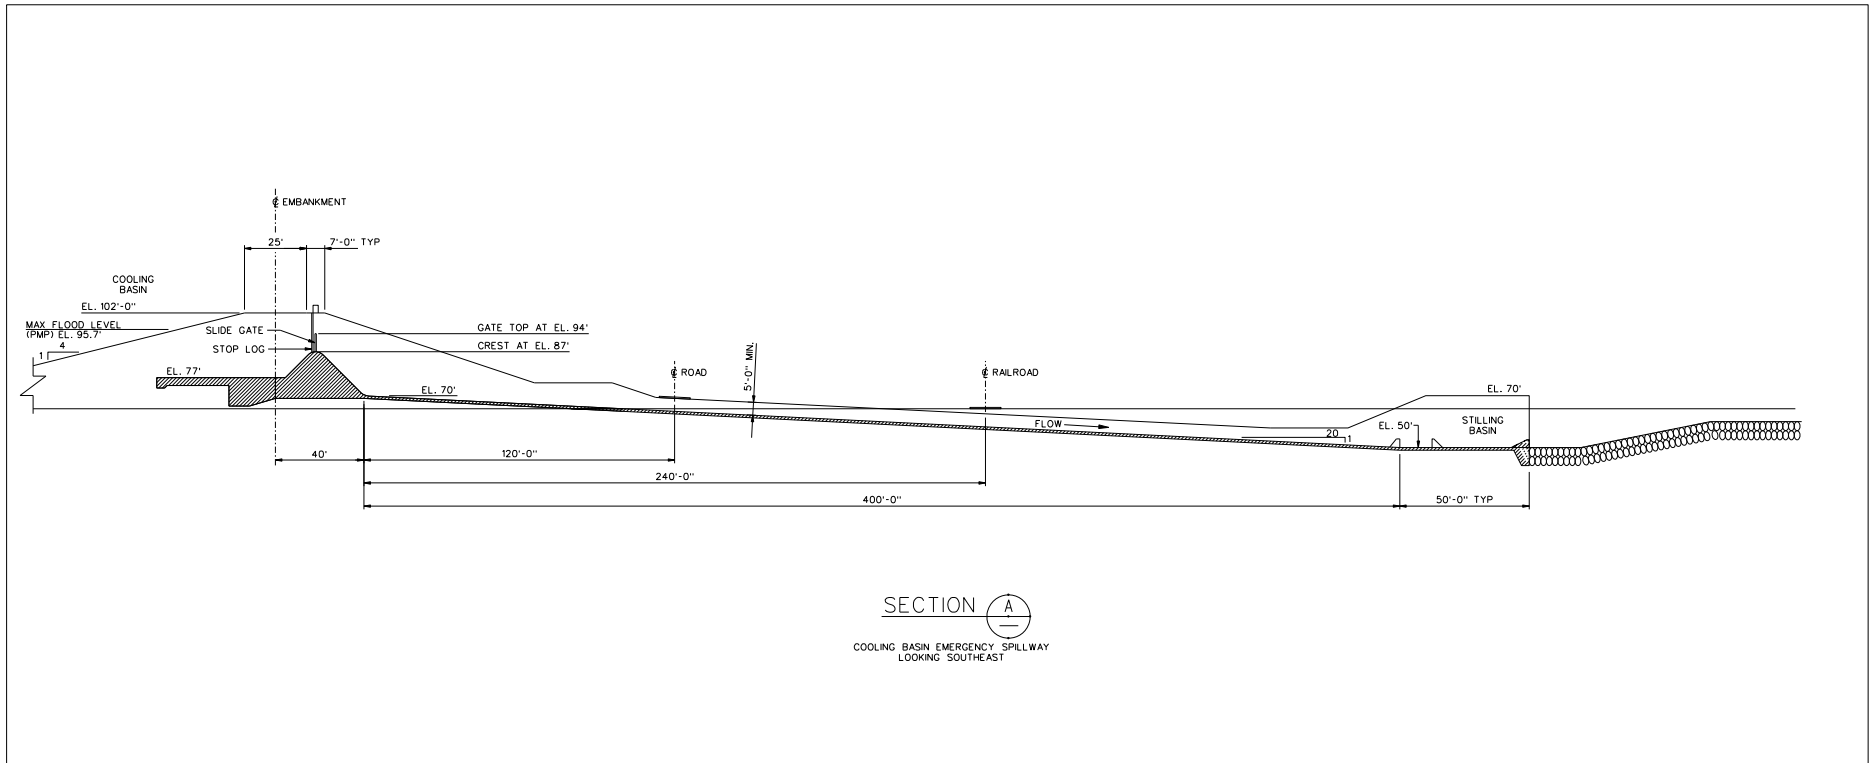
VCS Cooling Basin Emergency Spillway General Layout (Section View) — Typical
